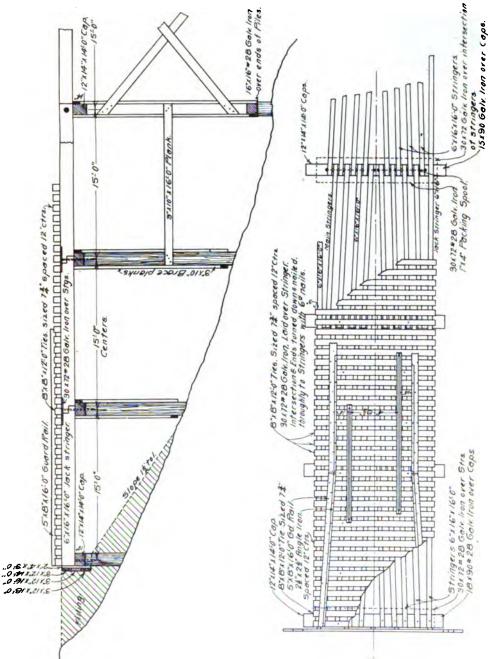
Pile and Trestle Bridges-Minn., St. P. & S. Ste. M. Ry.
